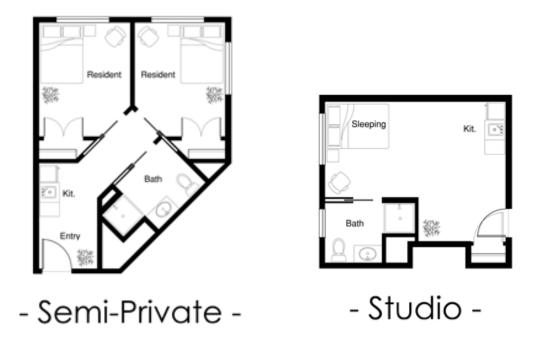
The Plaza Miliani: Typical Floor Plan of Residential Rooms
